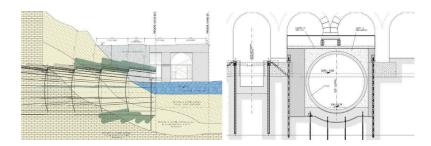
Bisagno diversion tunnel: downstream section. Longitudinal and transverse sections.
